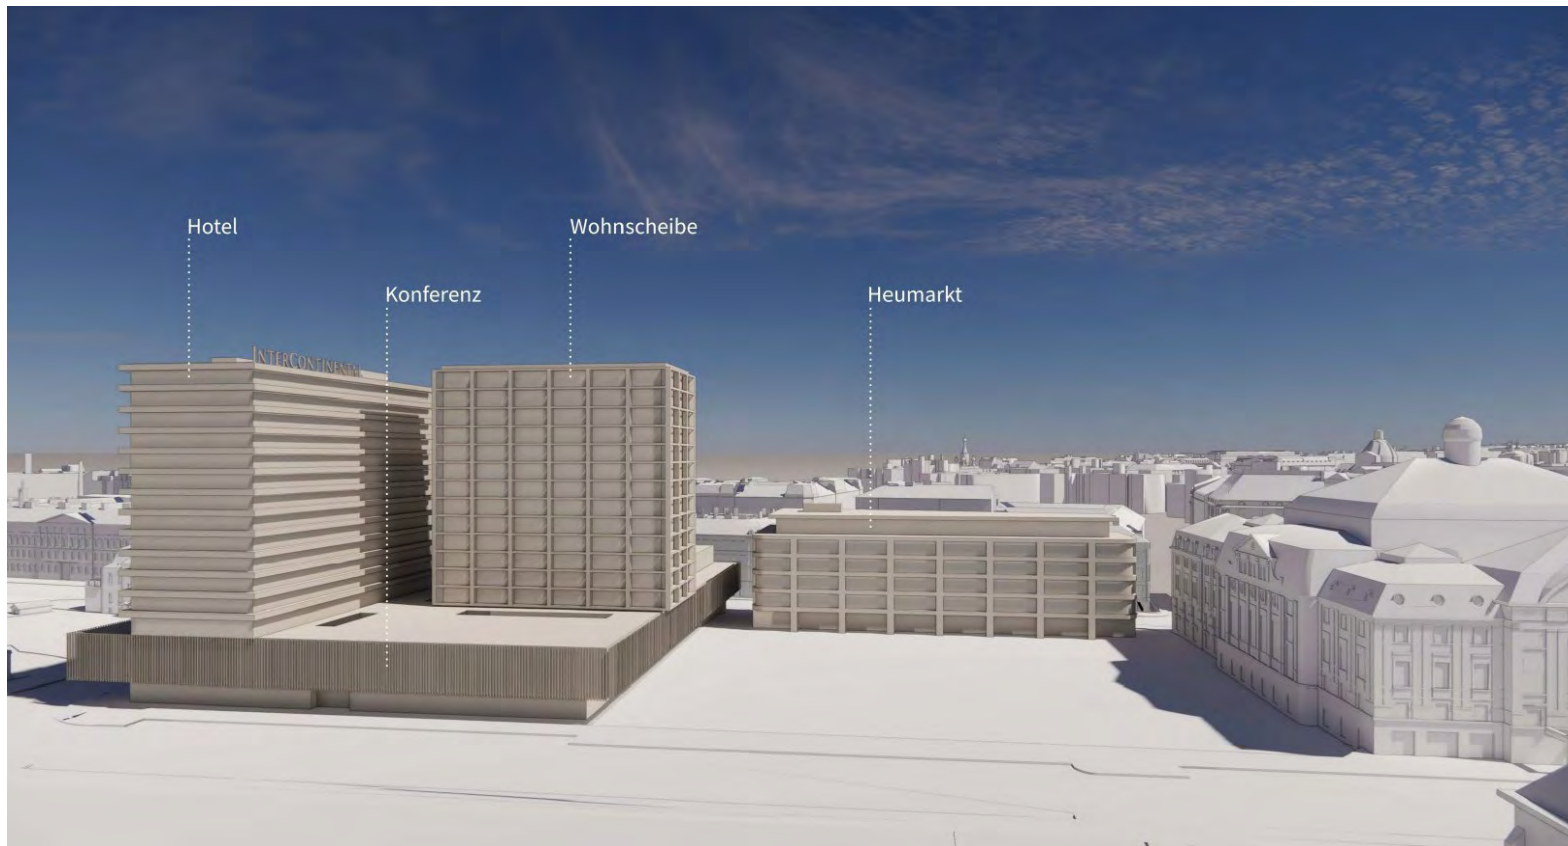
Façade structures of the three buildings (source: hochform. architects)
